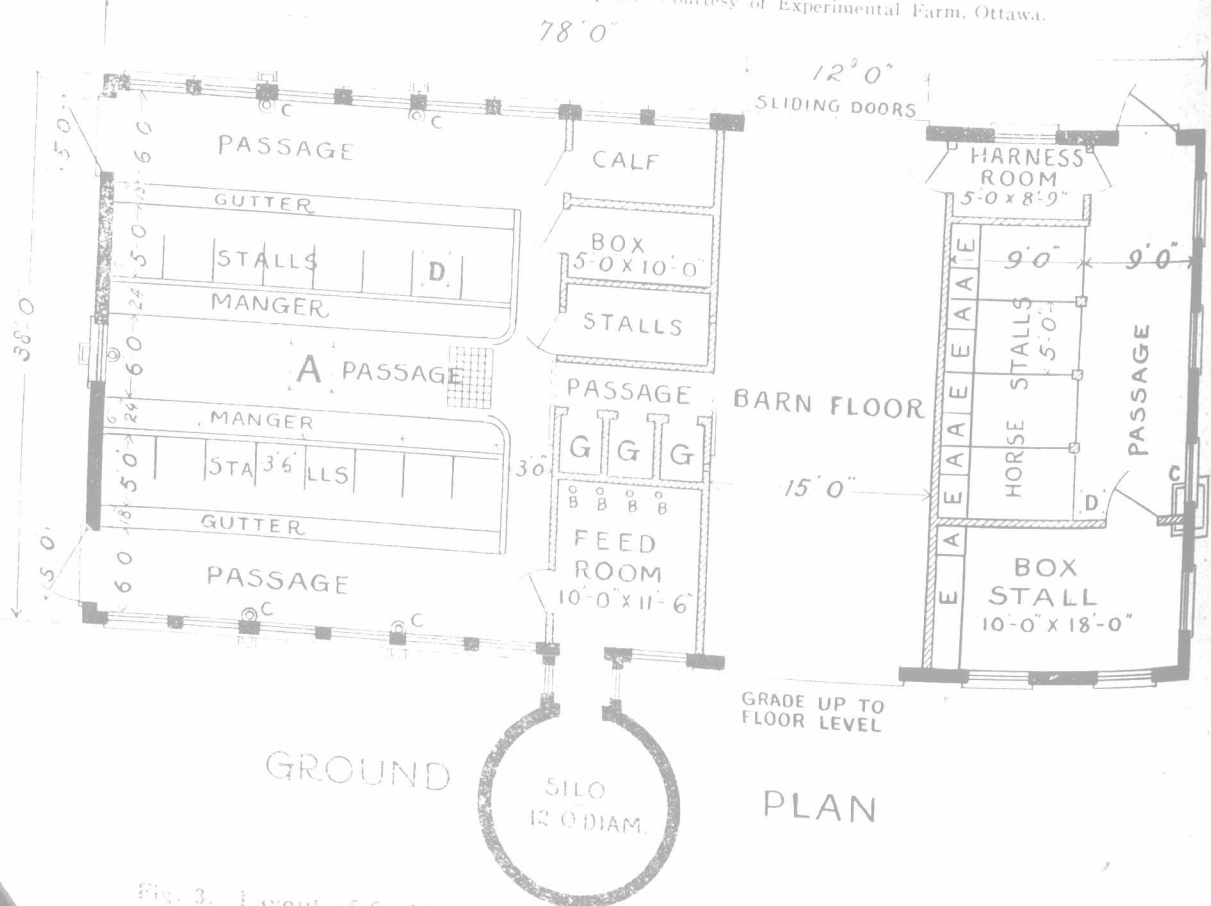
Layout of Stable when Barn Floor is on Level with Stable Floor.
